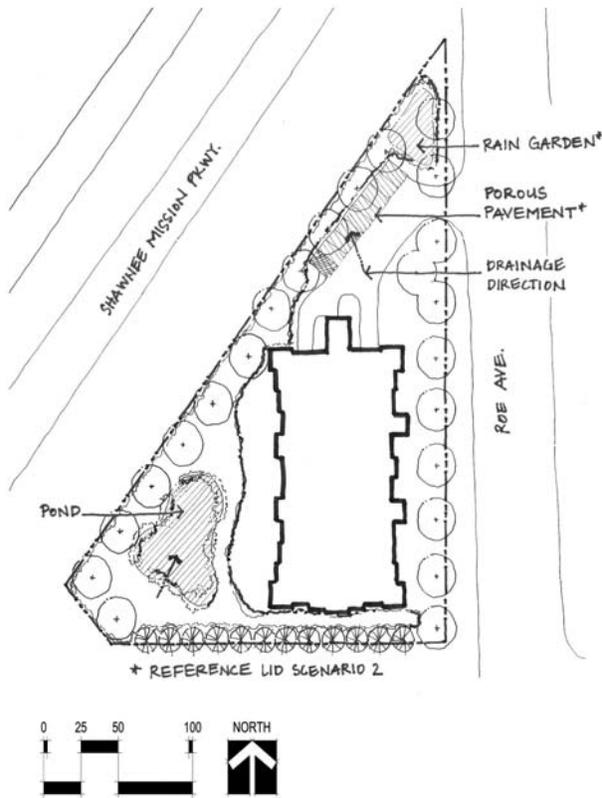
Roe Avenue Multi-Family Development Site Layout
